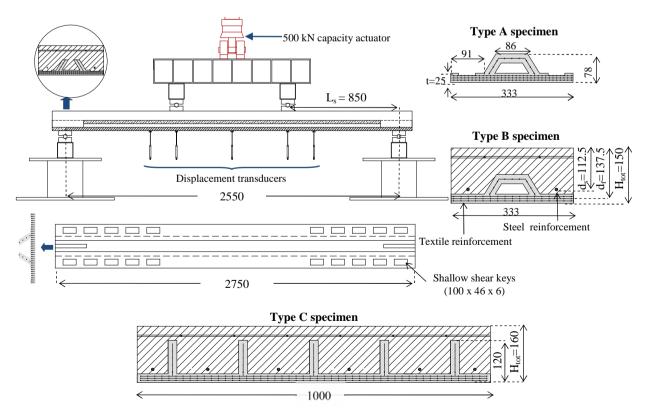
Test setup configuration and specimen types (all dimensions in mm)
